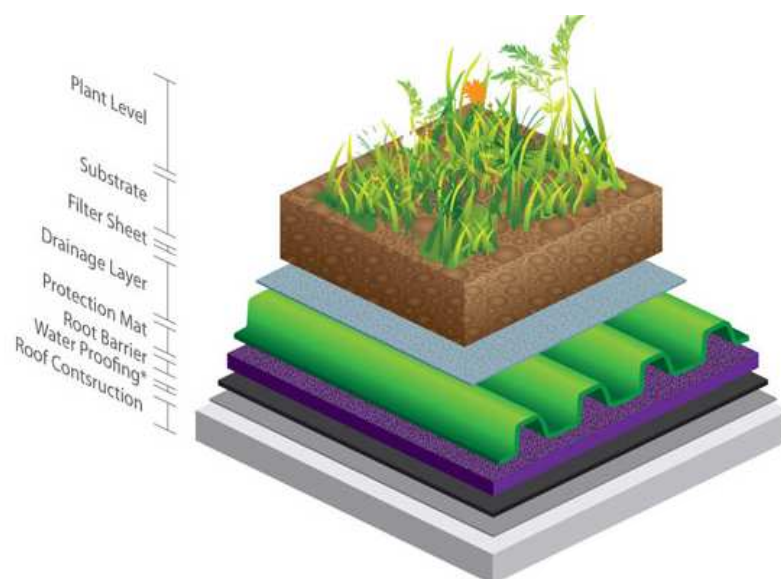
Standard construction of a green roof (Groundwork Sheffield 2012)
